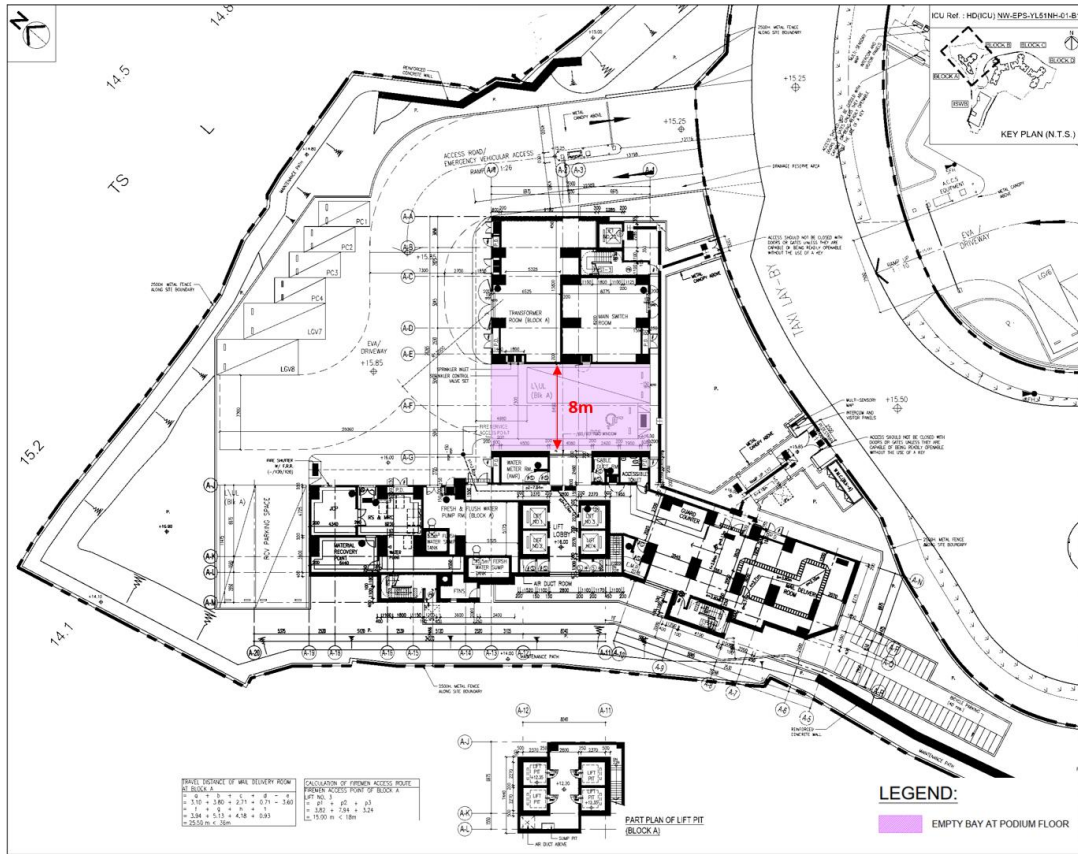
Layout Plan of Proposed Scheme at Site B (G/F)
